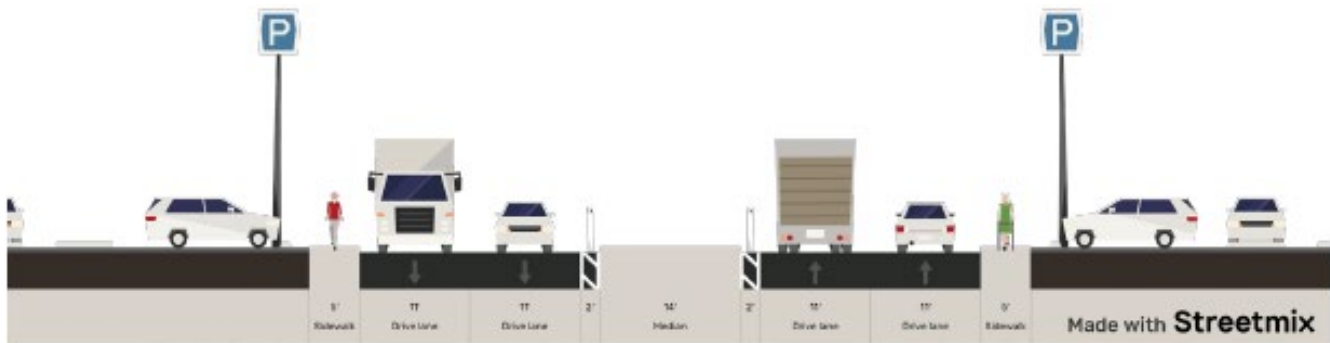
Demonstration Project Layout at Highway 29 and Kenwood Street
